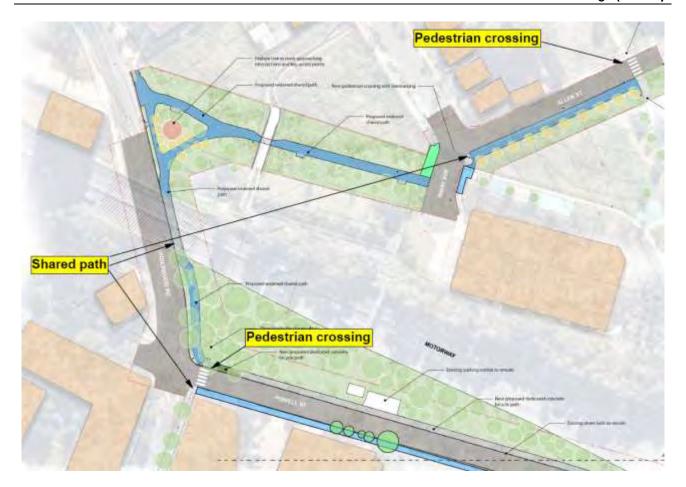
Section 5 of the HMaPP between Powell Street and Powell's Creek
